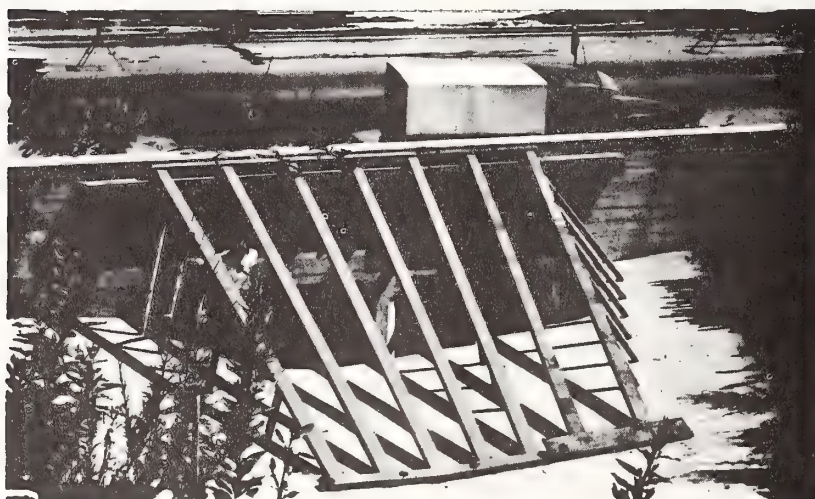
Steel grill debris rack with provision for cleanout afforded by concrete paved area in foreground.
